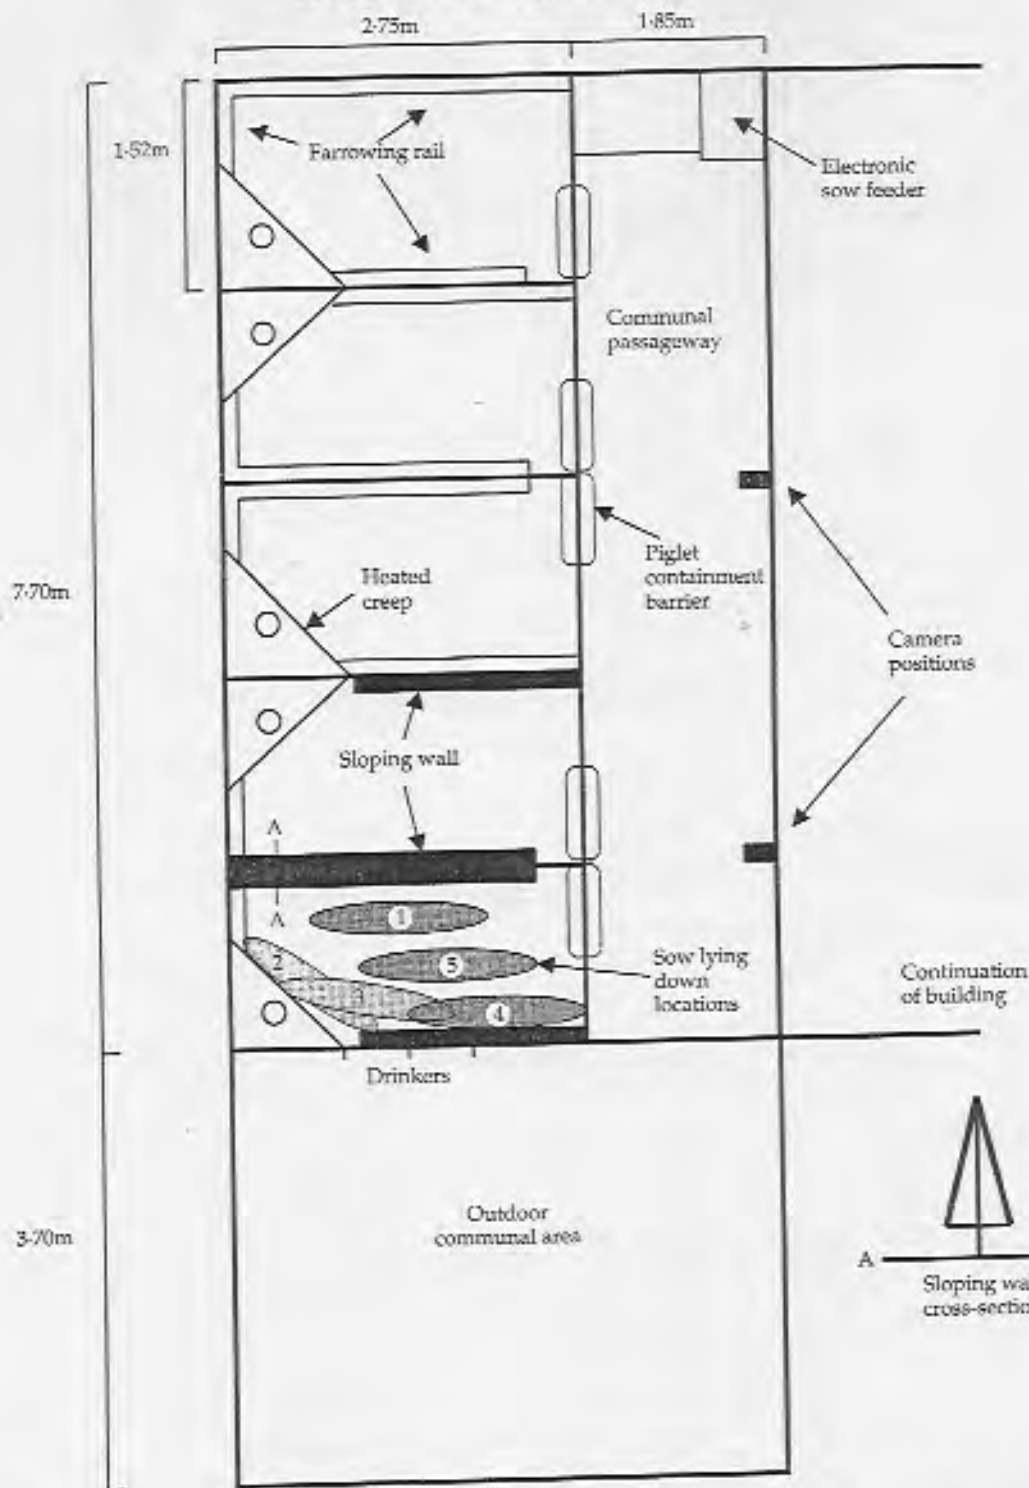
Floor plan of community farrowing system showing individual farrowing pens, communal passageway and outdoor area. A cross-section of the sloping wall (A-A) shows the piglet escape area. The five possible sow areas where the sow can lie down are shown: (1) long wall, (2) creep, (3) creep/creep wall, (4) creep wall, (5) open.
